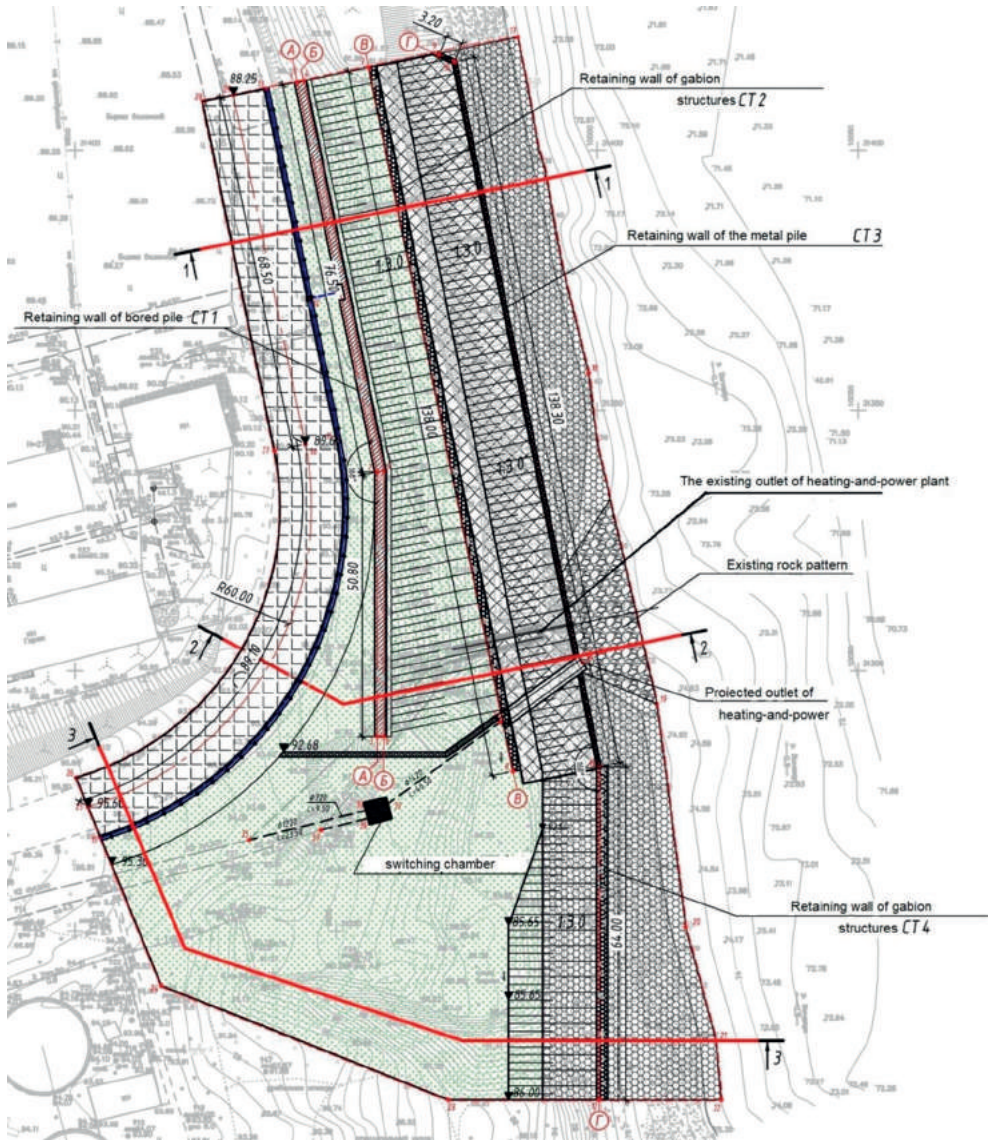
Layout 3 selected cross sections of the construction and all of retaining walls
